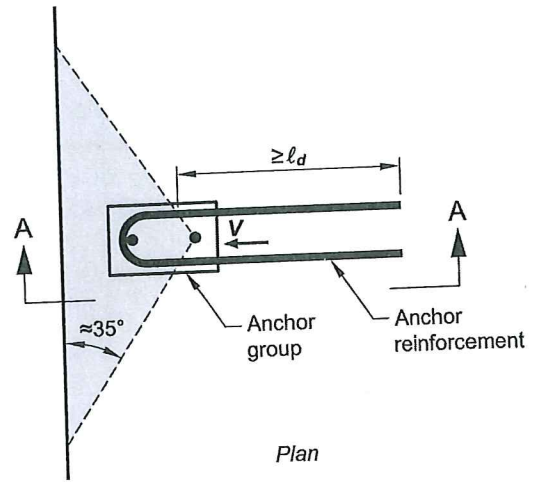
Hairpin anchor reinforcement for shear.
